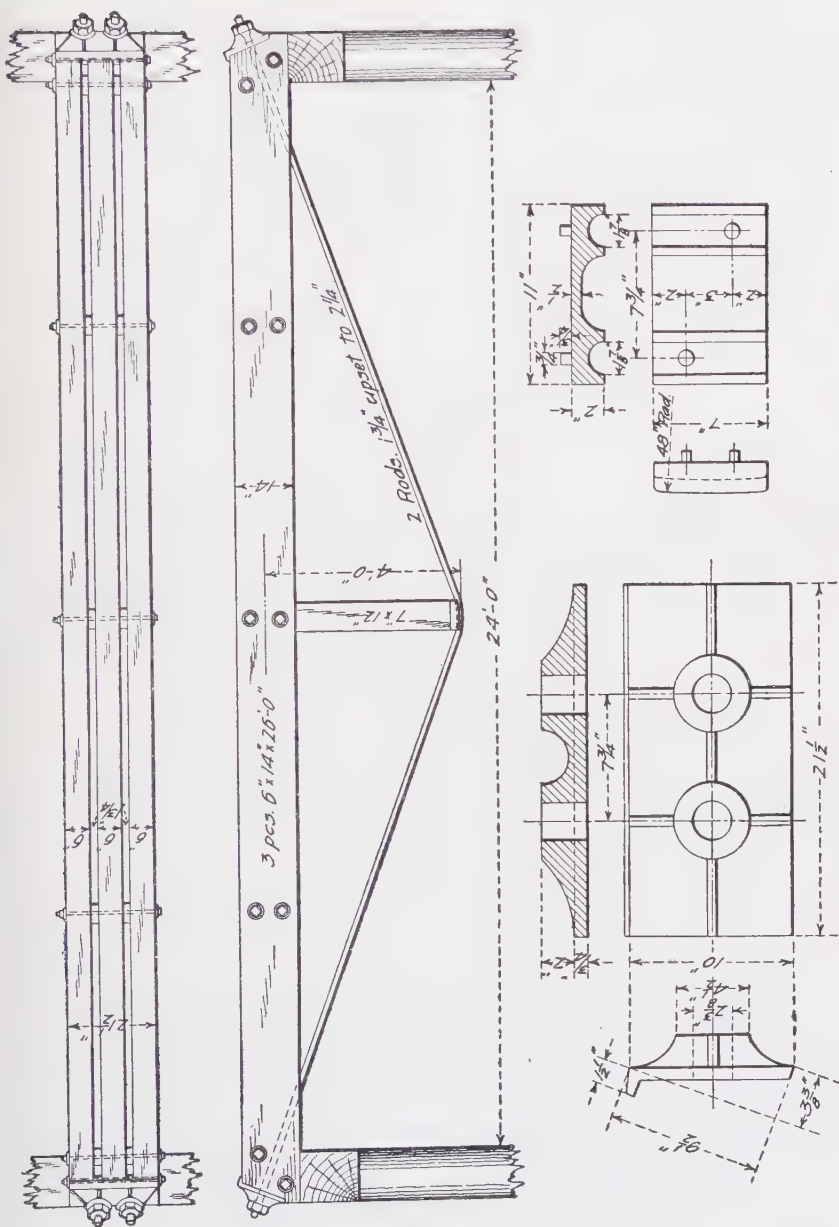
Trussed Beam on One Side of a Railroad Beam Bridge.
